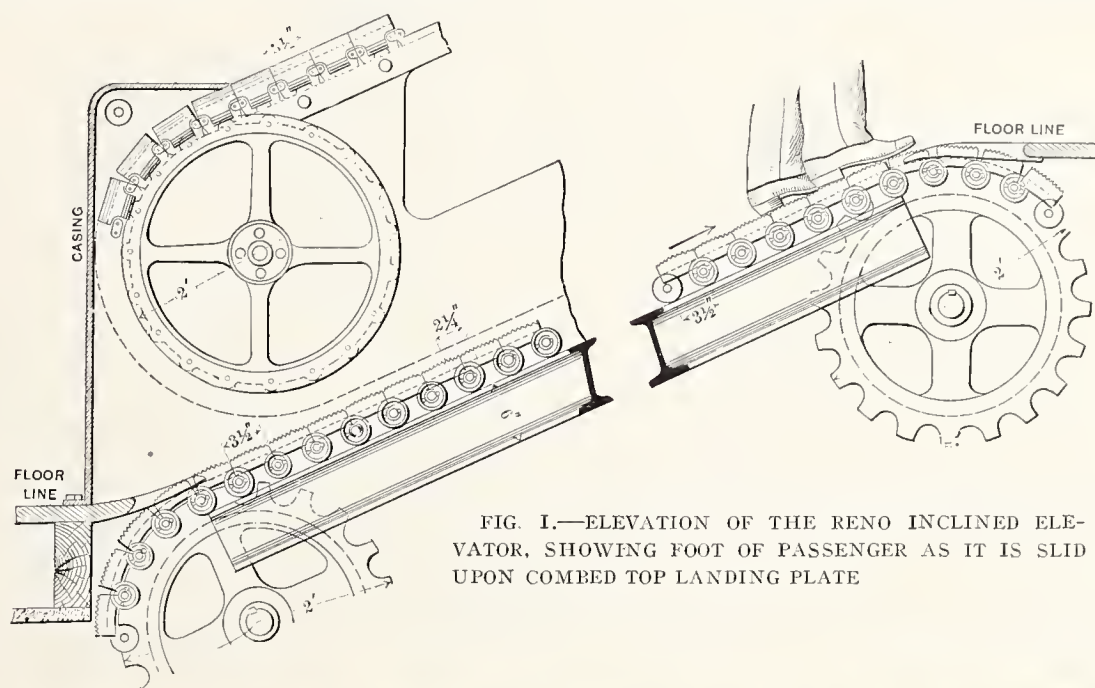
ELEVATION OF THE RENO INCLINED ELEVATOR, SHOWING FOOT OF PASSENGER AS IT IS SLID UPON COMBED TOP LANDING PLATE
